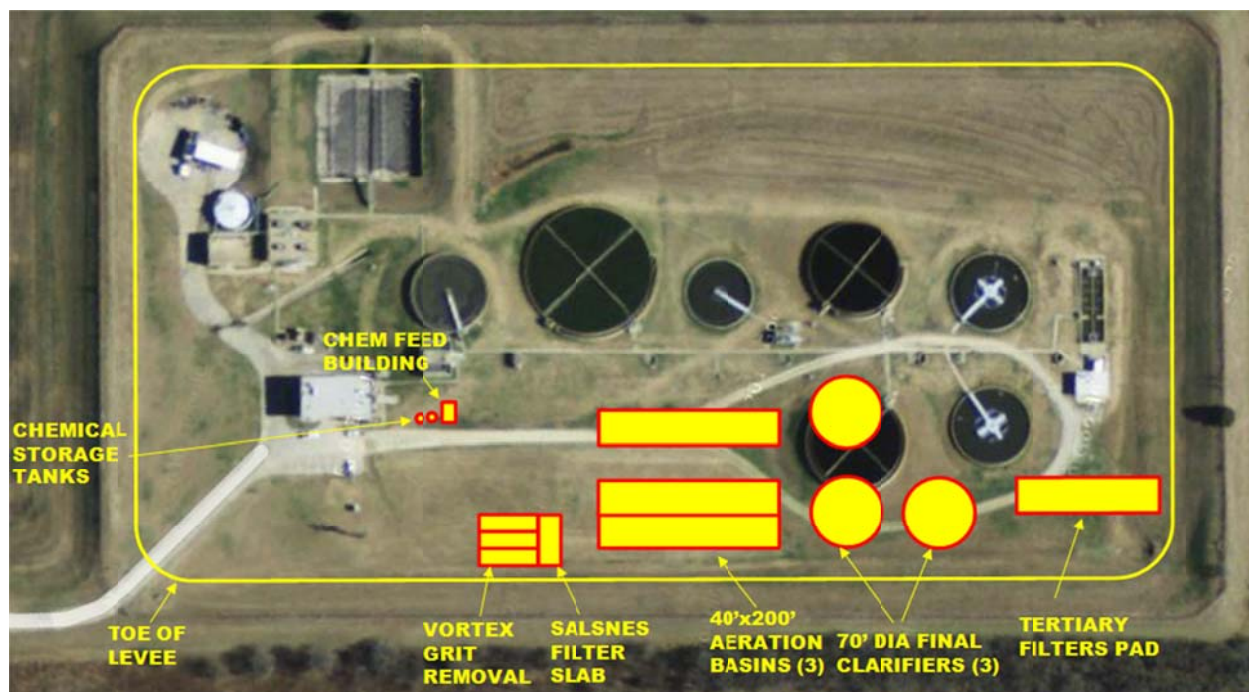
Site layout for a new activated sludge facility at the King's Creek WWTP
